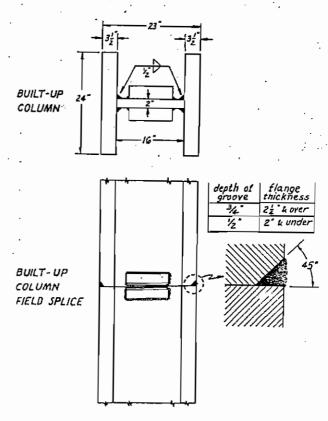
Typical column splice on Detroit Bank & Trust Building.
